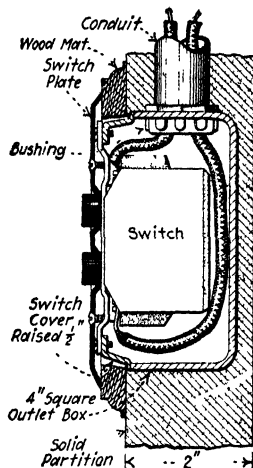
Section through a 2-in. partition containing a standard-size switch. Note that a wood mat must be placed under the switch plate because the box and switch cannot be placed entirely within the thickness of the partition.
